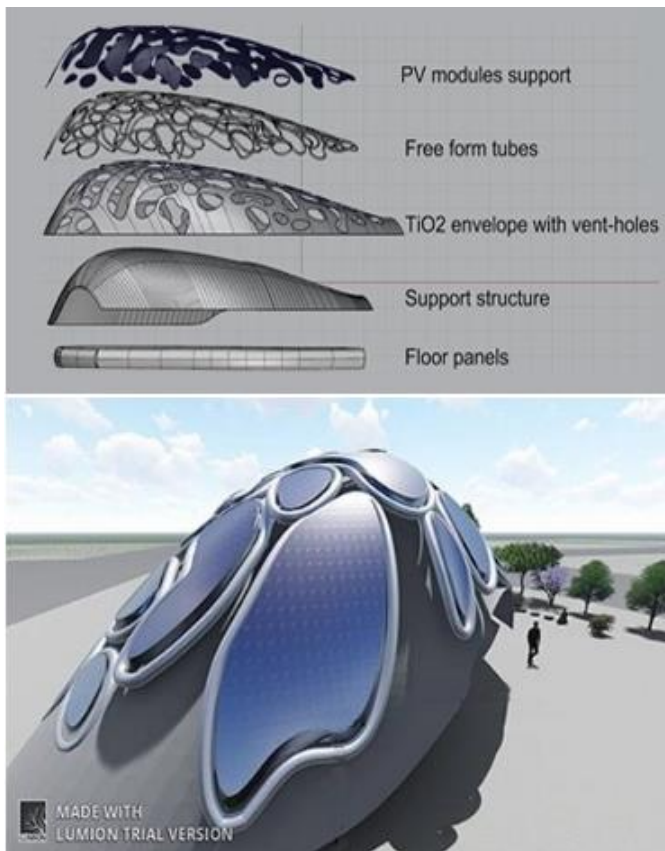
Meryem Alagoz, Sun and Shadow Pavilion – multilayer sensitive building envelope
